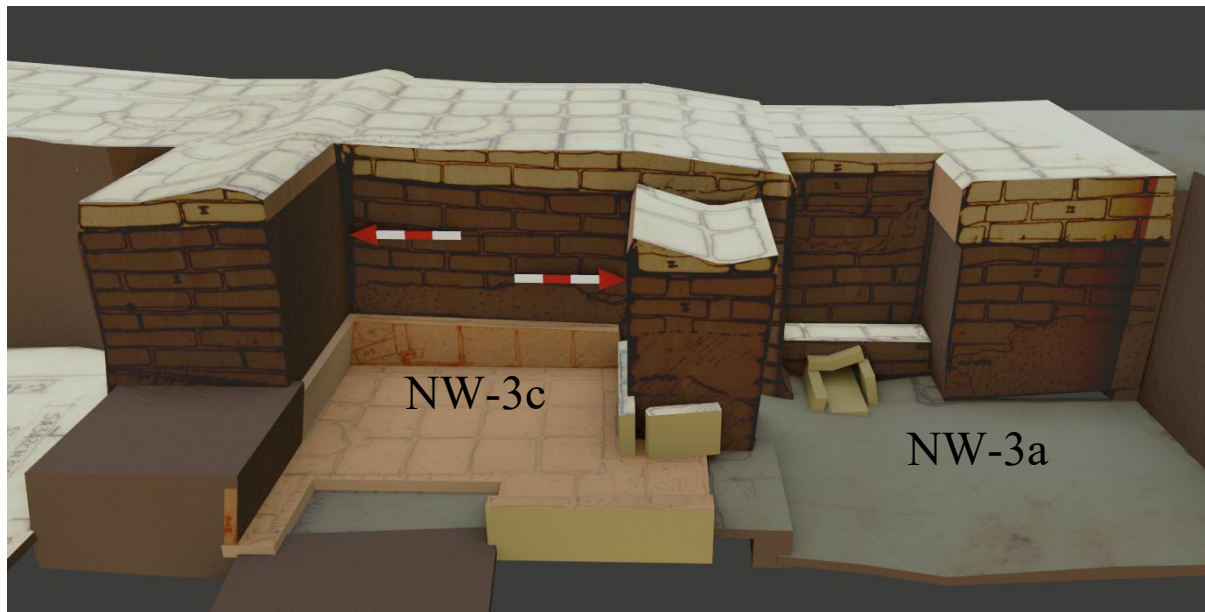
Walls of spaces NW-3c and NW-3a. Lower part abutting against, higher part bonded to fortification wall. Arrows indicating abutting joint lines.
